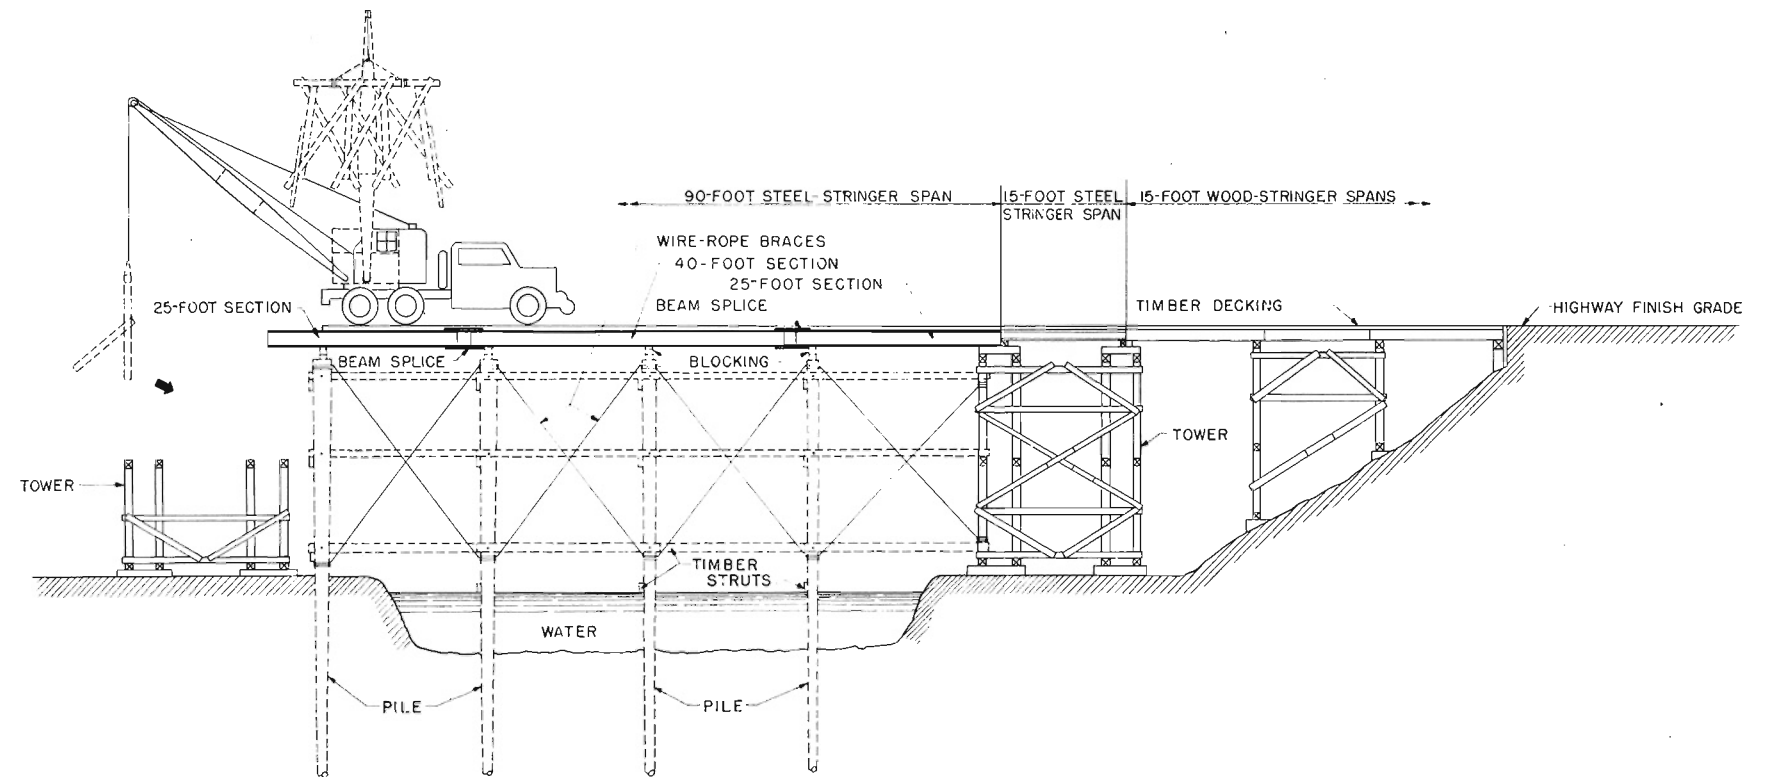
Ninety-foot steel-stringer span on timber towers erected on falsework. Crane is shown erecting far tower from span supported on falsework.
